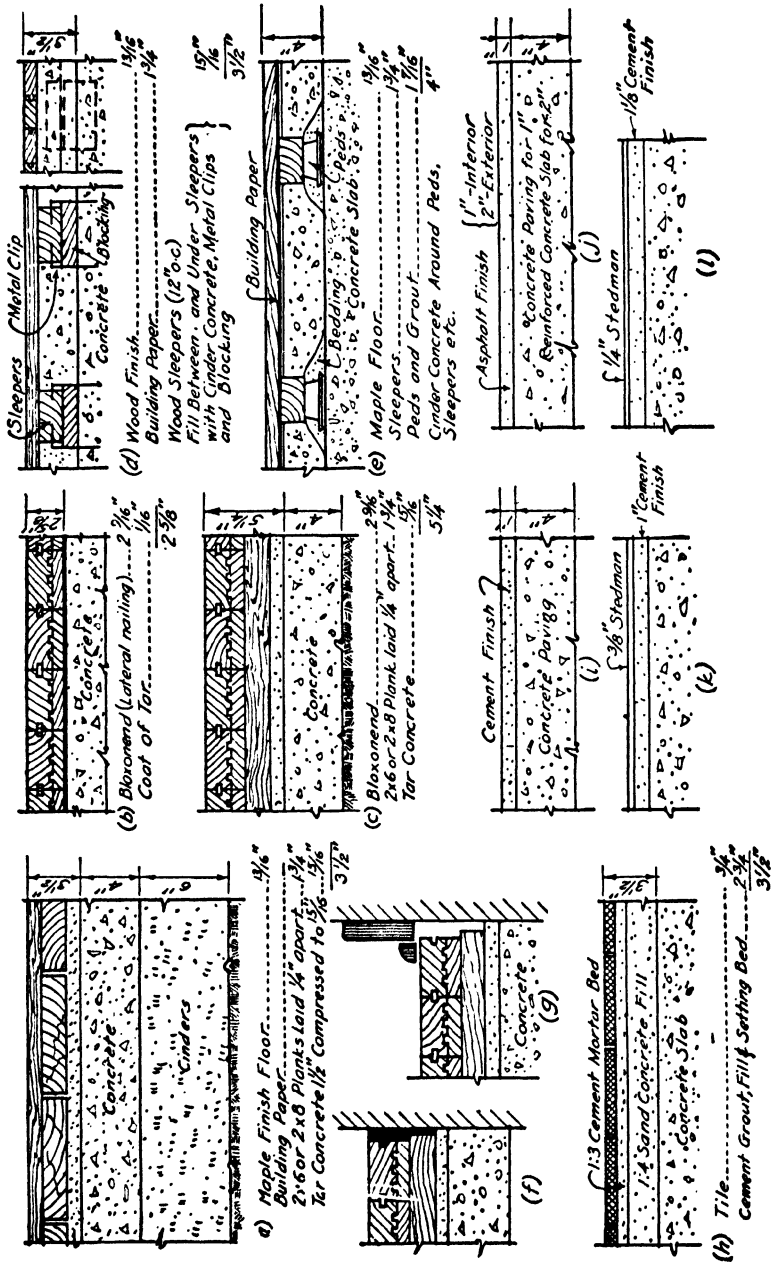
Attaching Finish Floor Surfaces on Concrete Slabs.
